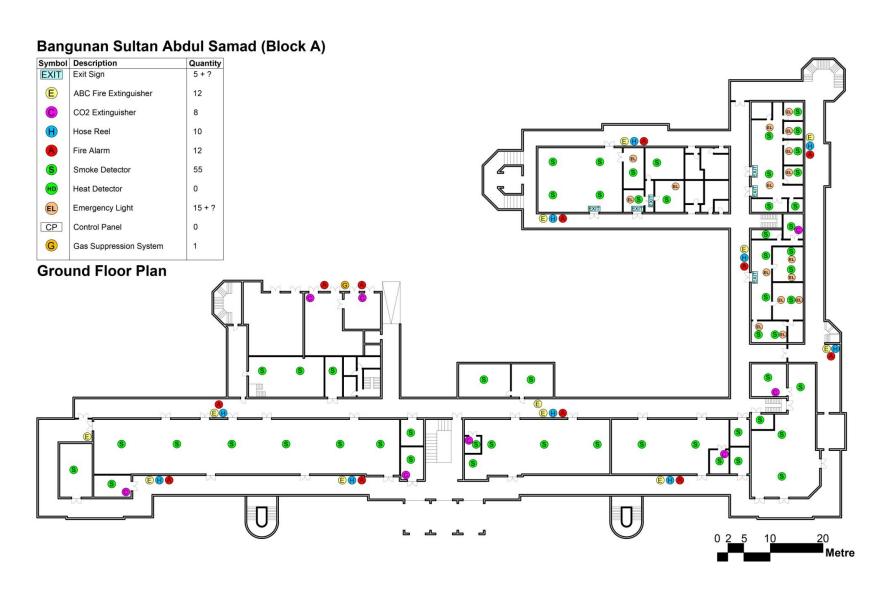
Location of active fire protection measures at Ground Floor level of Sultan Abdul Samad Building
